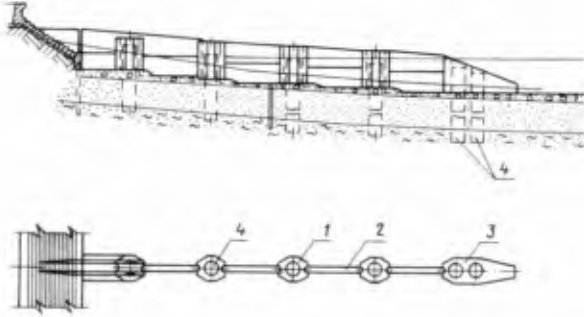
Scheme of the groin made of reinforced concrete slabs.
